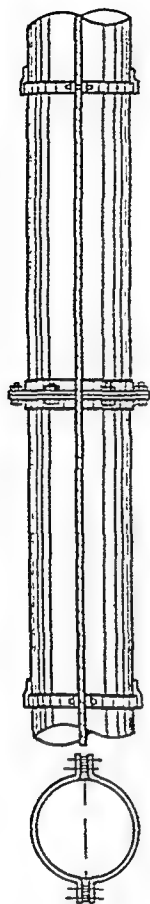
Suspension of ventilation ducting in shaft sinking
